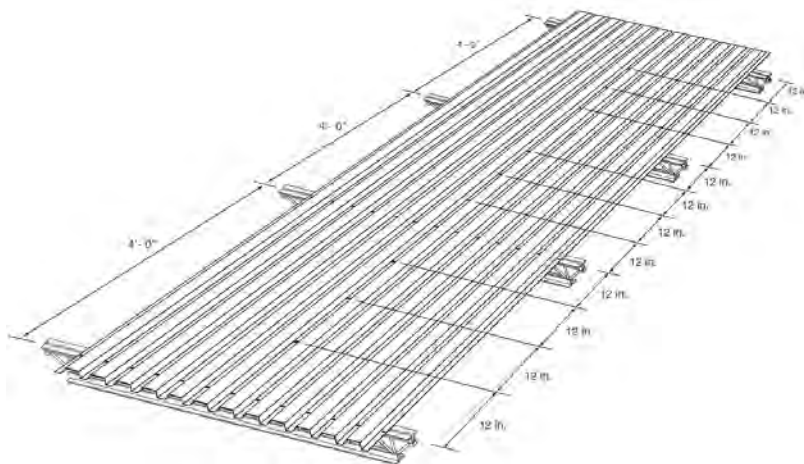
B-, BI- AND PLB DECK FRAME FASTENER PATTERNS
